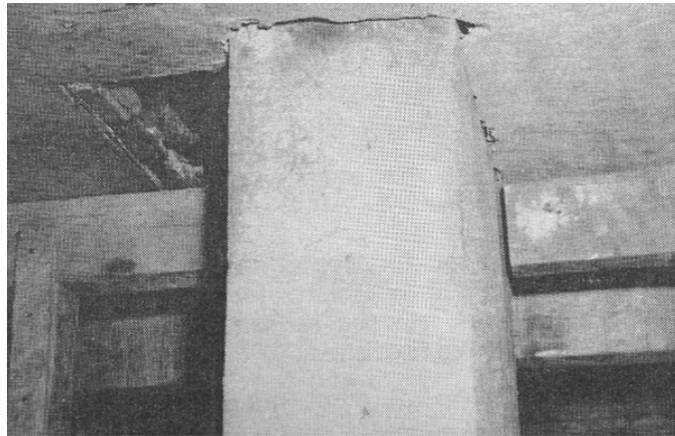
Punching shear failure at a connection with an opening (Feld 1964)
